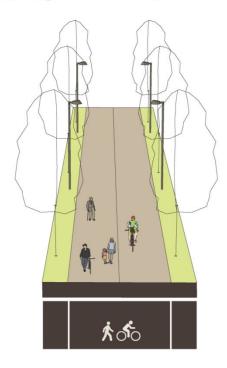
Narrow Street 2 (Through Block Connection)
